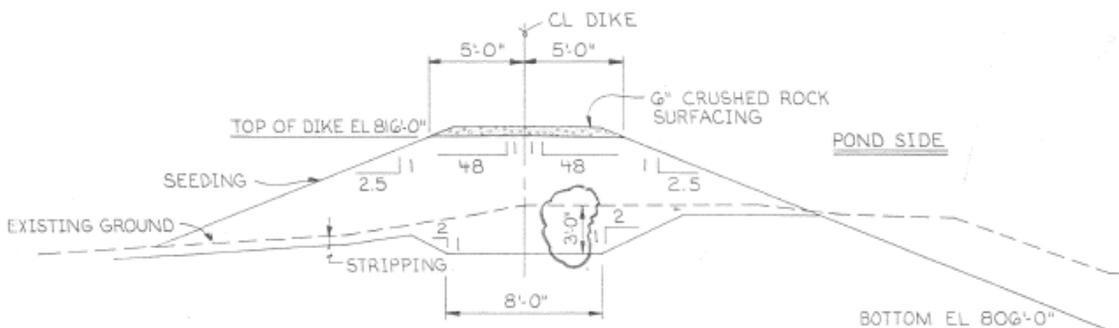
Typical Embankment Cross-Section of West Embankment, (Black & Veatch, 1977)
